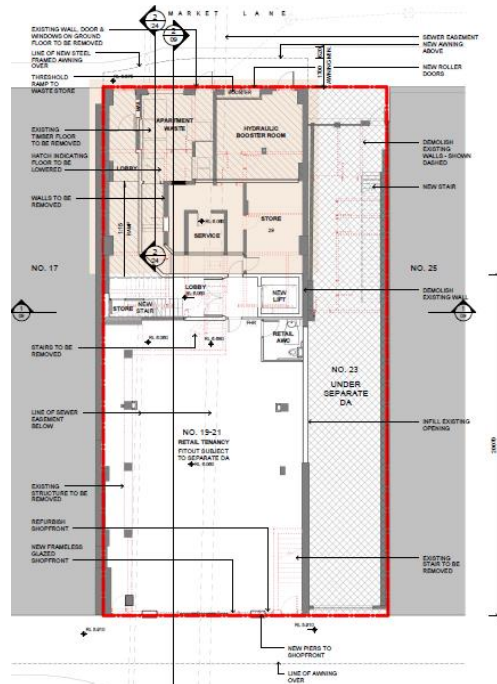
Proposed Ground Floor Plan. (Source: NBRSEARCHITECTURE)
